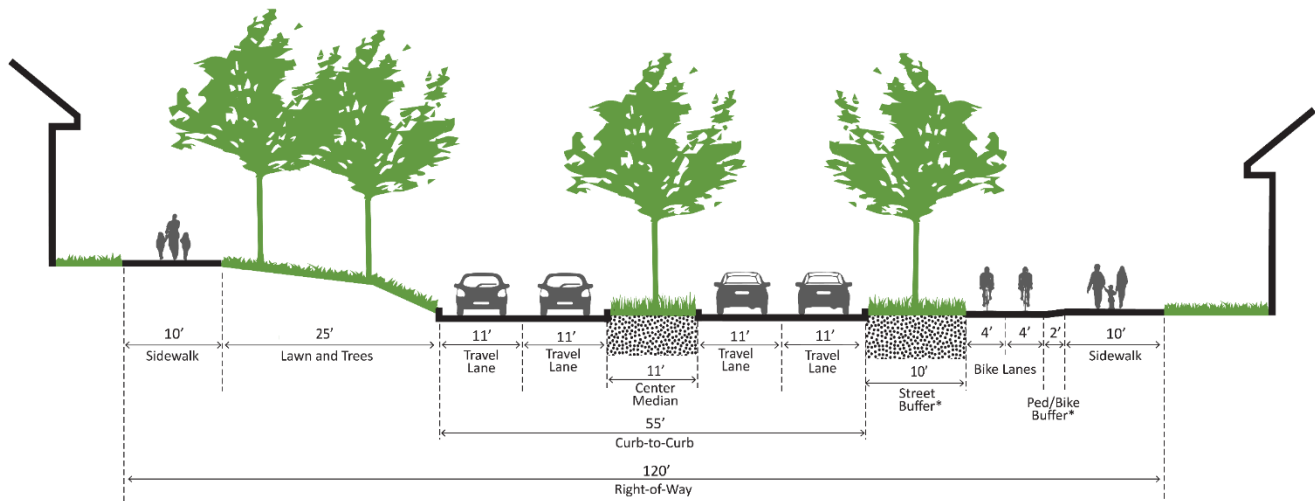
Georgia Avenue (M-8): Blair Mill Road to Eastern Avenue, Looking North
